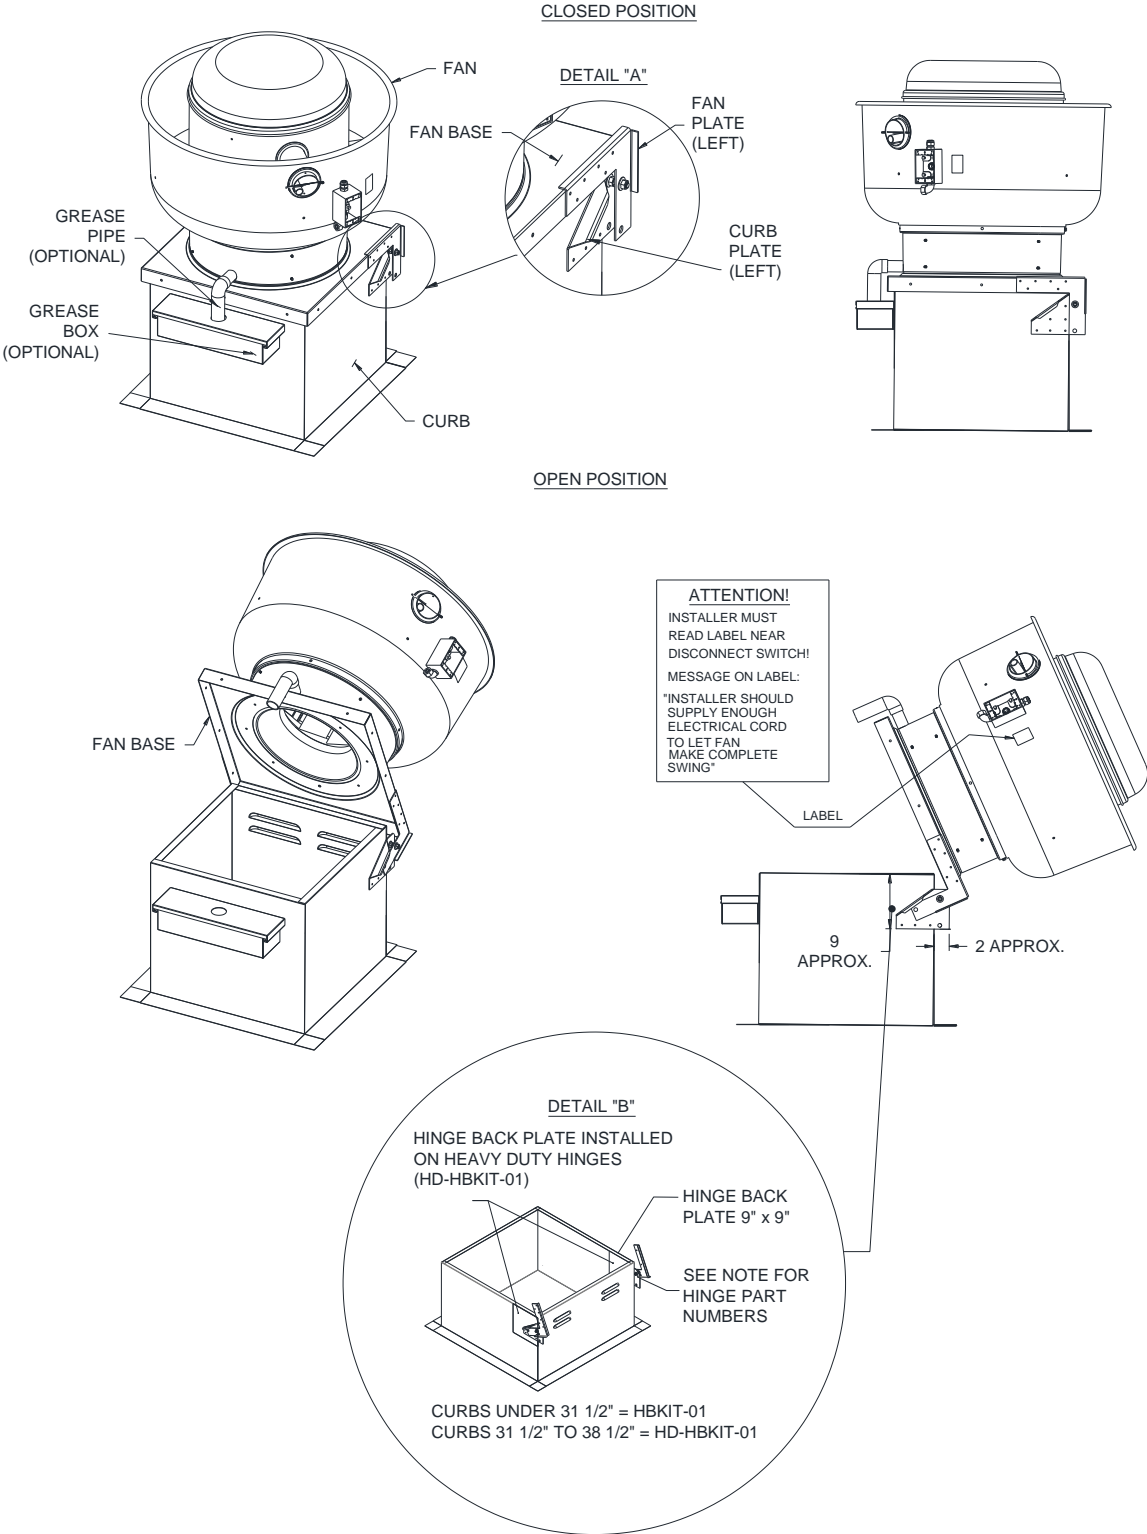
Heavy Duty (HD) Hinge Kit Installation Details
